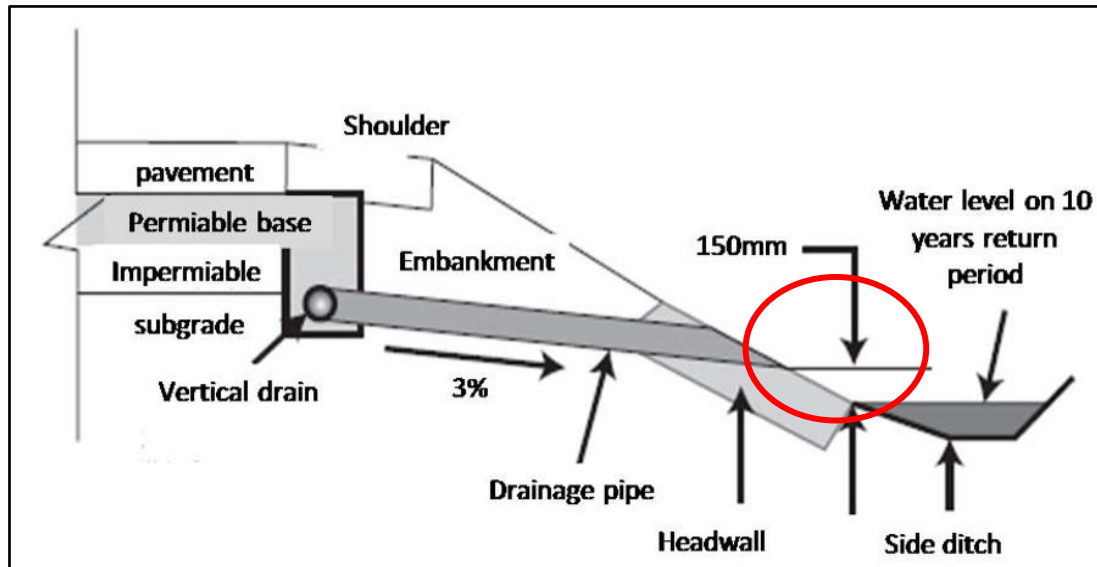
Typical Design Cross Section of Shwe Bo - Myitkvina Road
